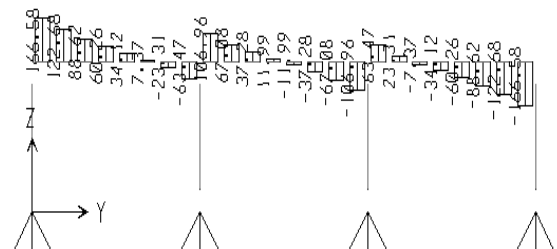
Axial forces in beam in system 2 due to horizontal loads at gridline 1
